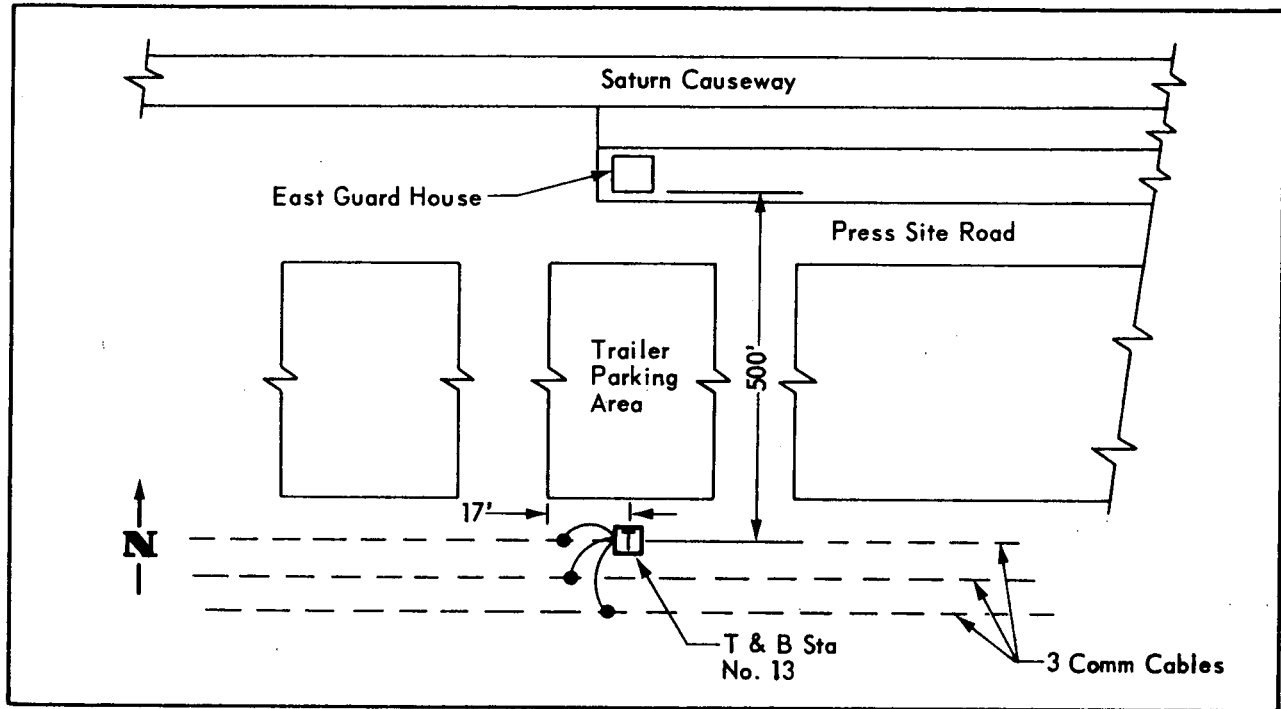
Test and Bond Station No. 13 Equipment Locator
